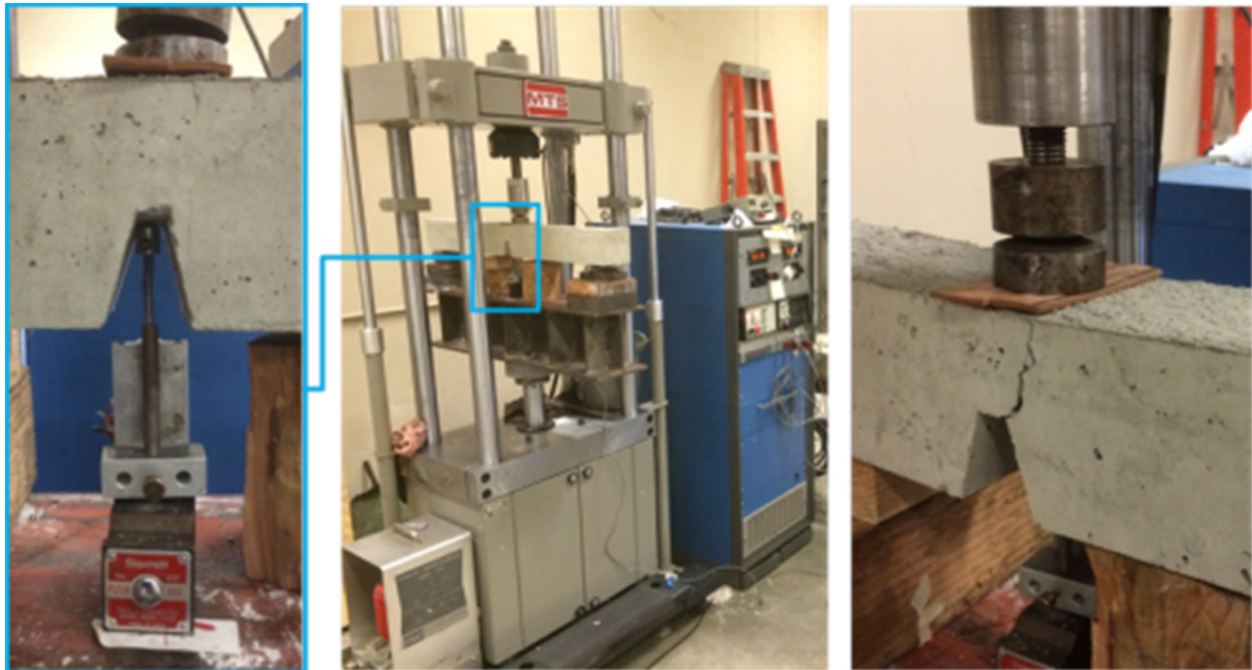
Notched-beam test set-up, instrumentation, and mode of failure.
